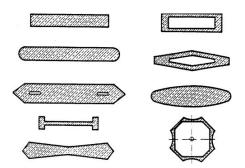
Typicalcross-sectionshapesofpiersforriverandwaterwaycrossings.
